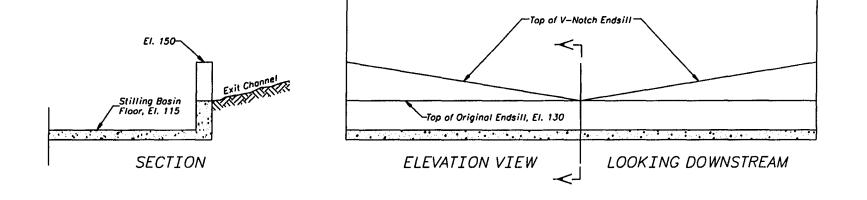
Structural modification #2, basin end sill raised 20-ft in a V-notch style.
